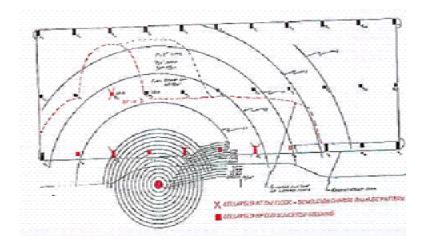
Diagram showing elements damaged by initial blast adjacent to Murrah Federal Building
